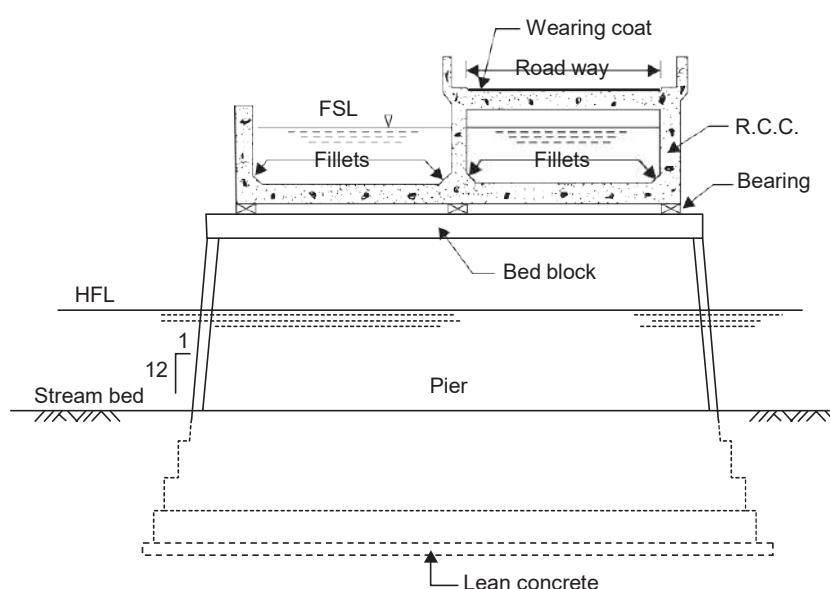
(c) Typical section of an aqueduct (Type III) (1)
